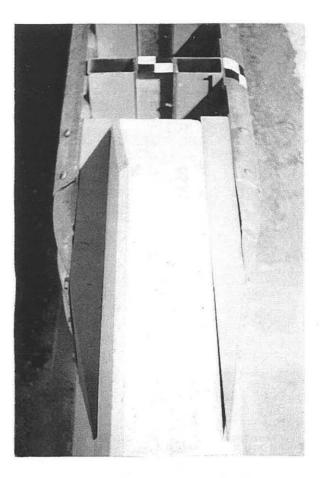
Connection between Single Slope and Approach Guardrail, Design No. 1
